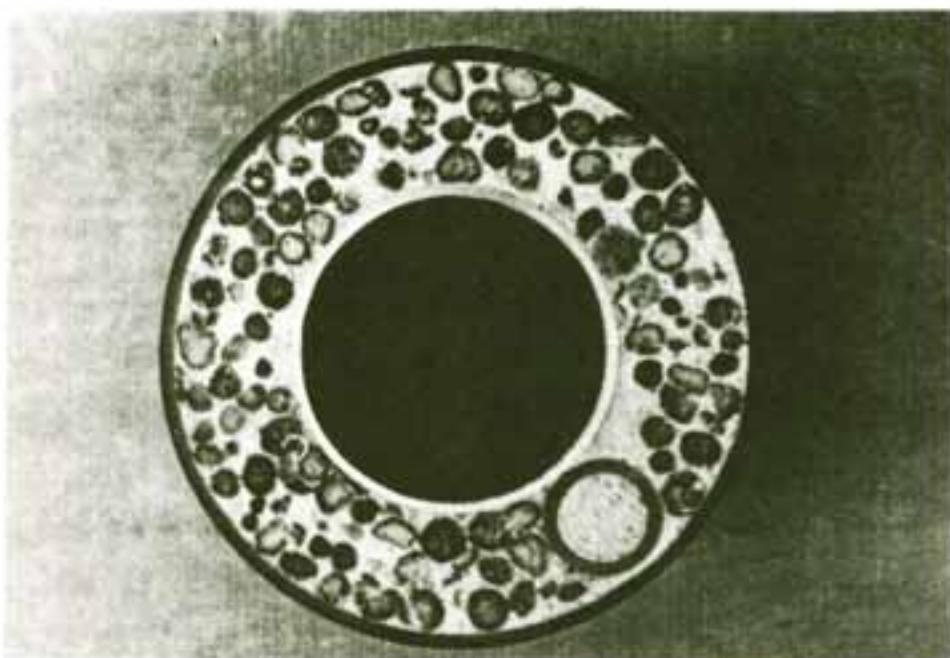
Sectional view of the transverse loadable plastic jacket pipe (first Standard Type).
